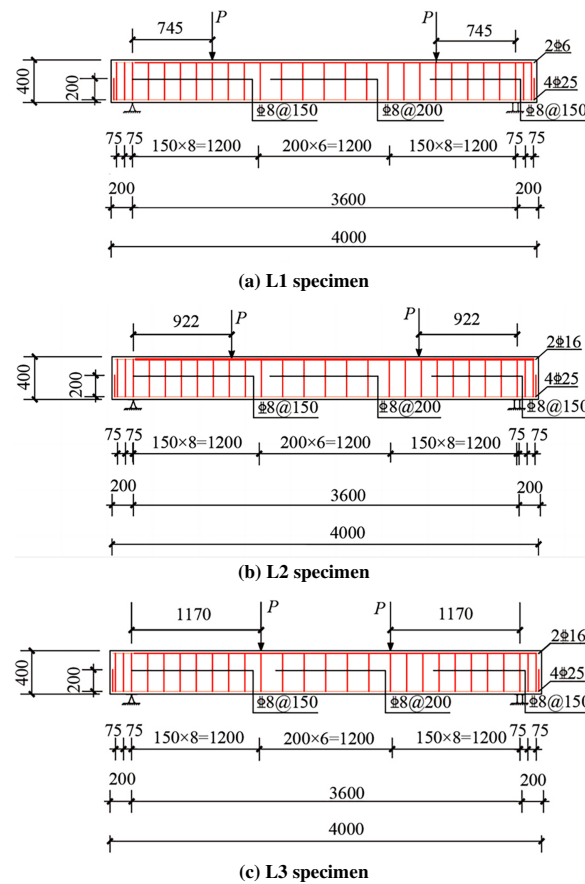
Geometry and reinforcement details of full-scale RC beam specimens (L1–L3).
